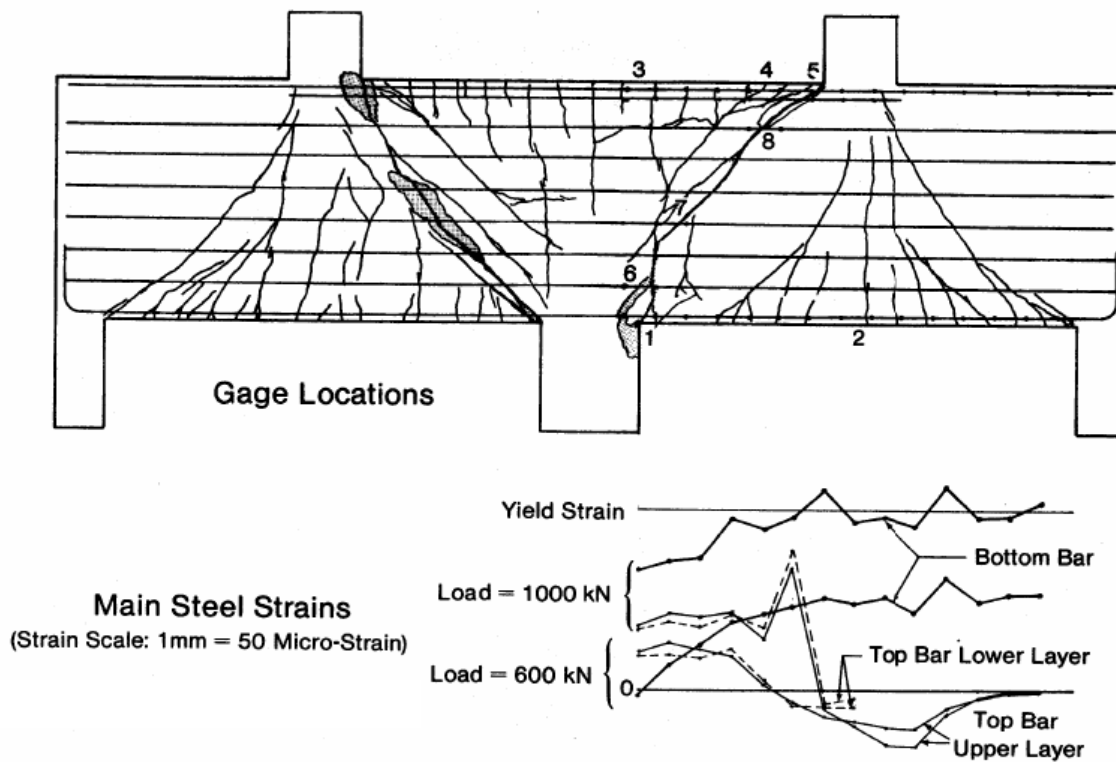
Strains in longitudinal reinforcement and gage locations
